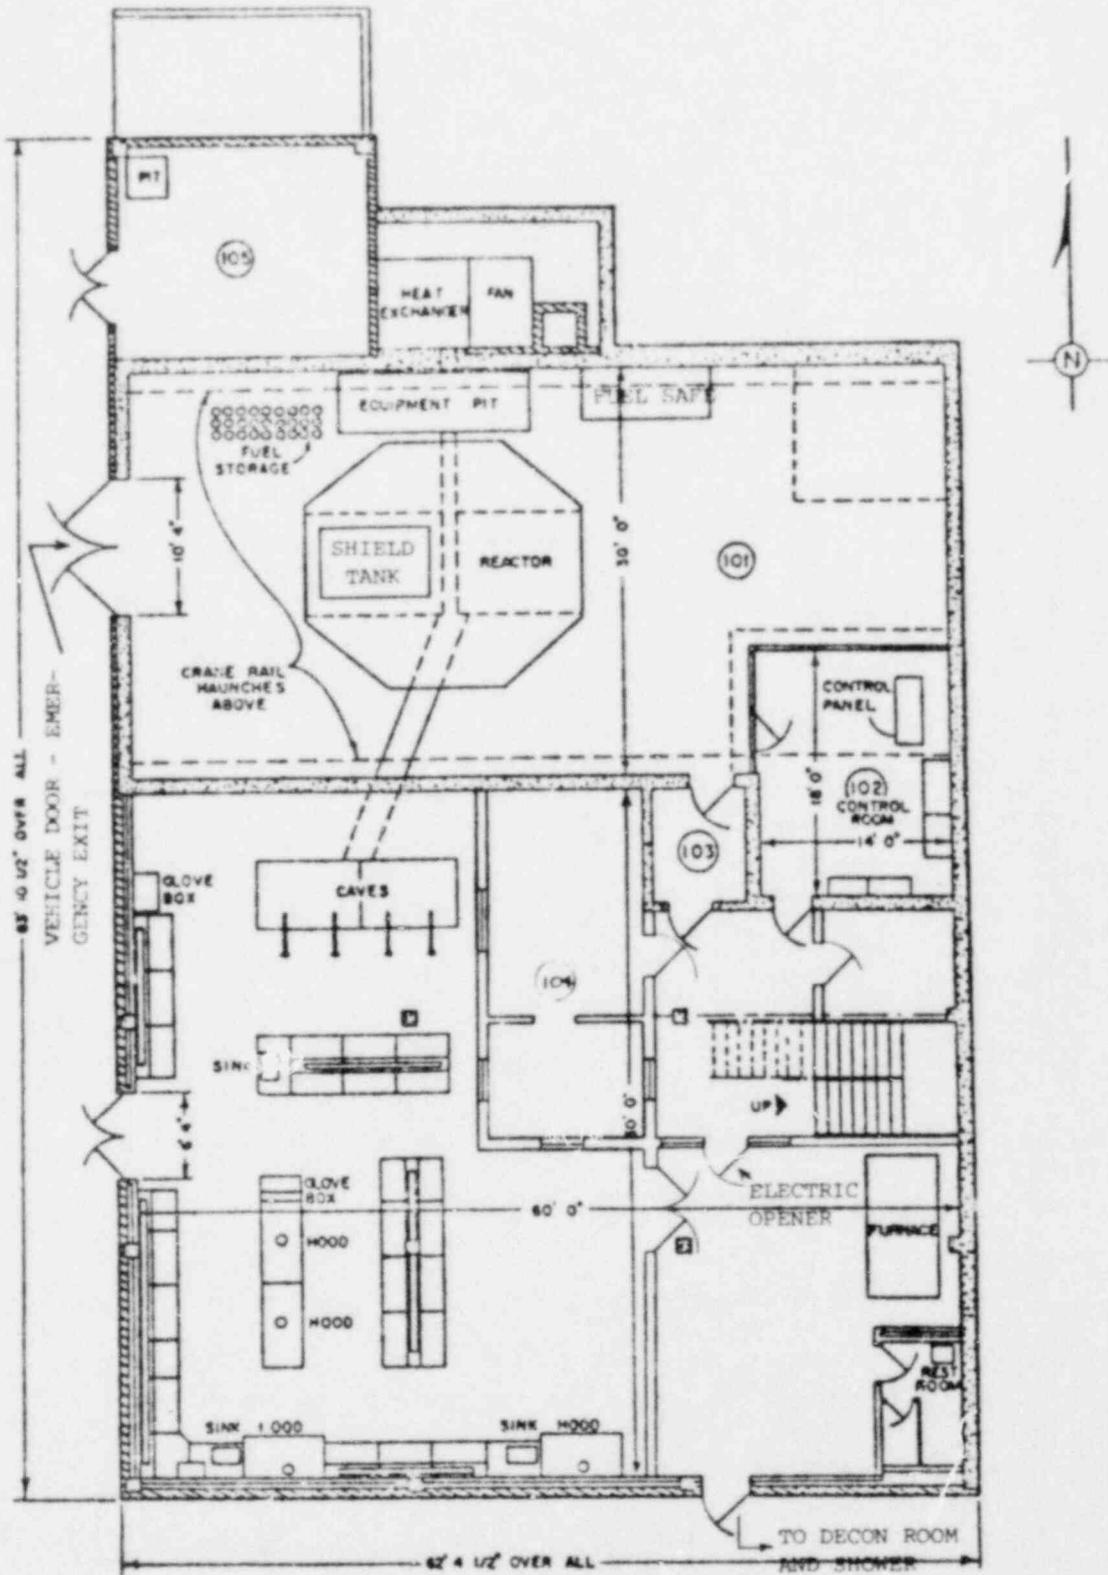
First Floor Plan for the University of Florida Training Reactor Building.
